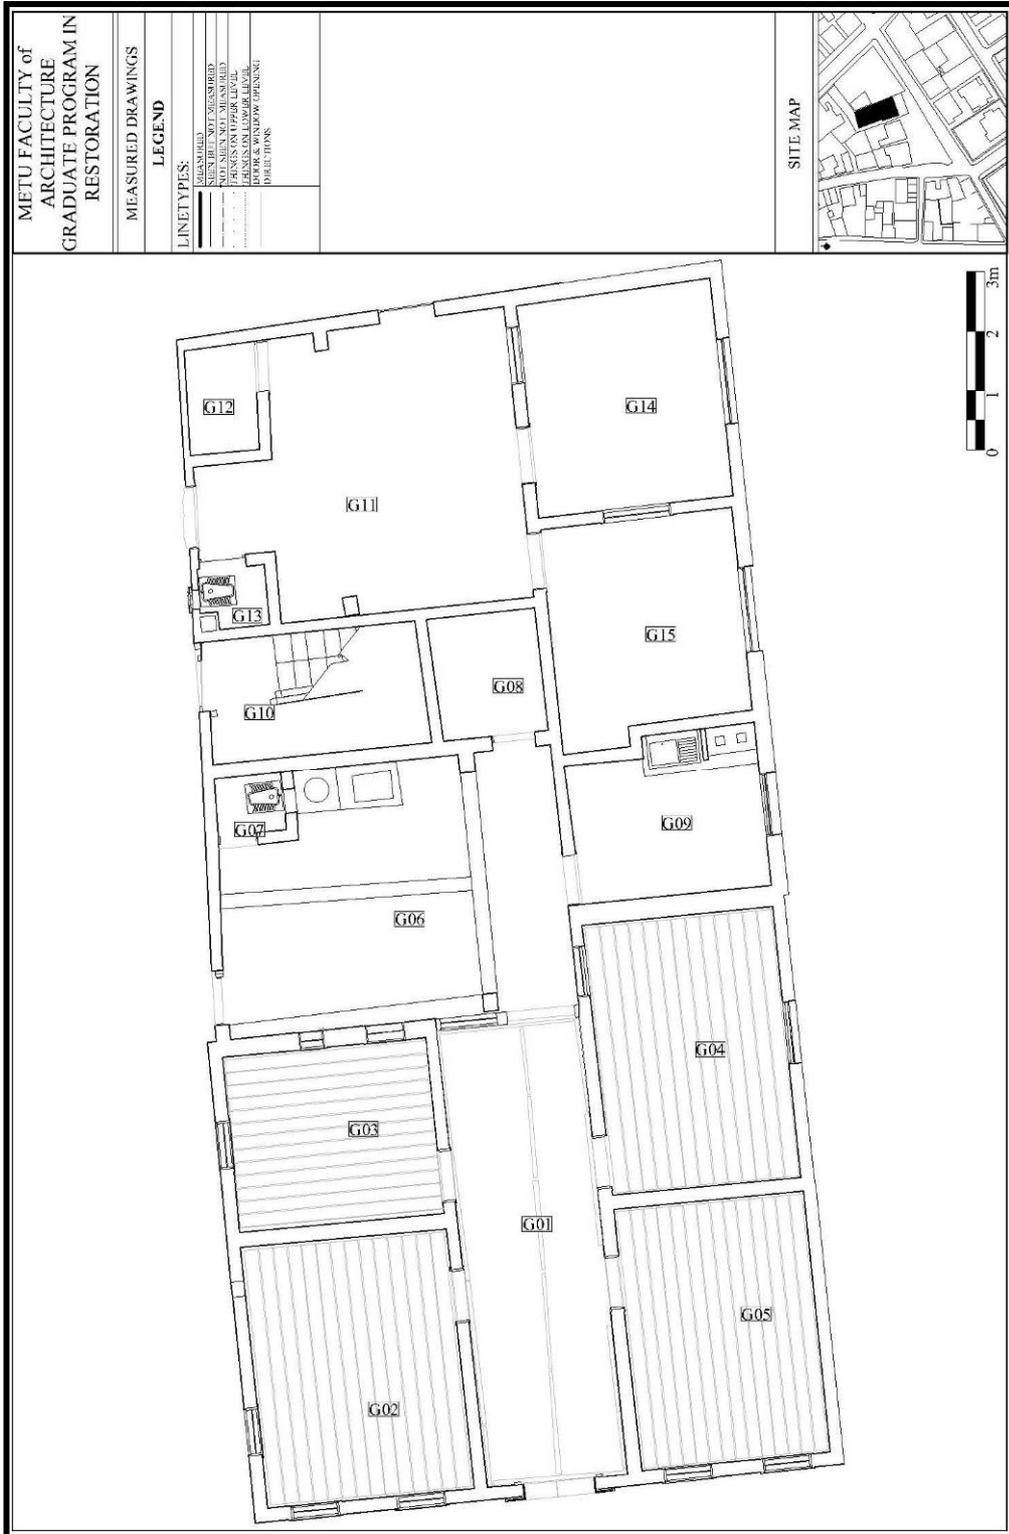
Ground Floor “Reflected Ceiling Plan”
